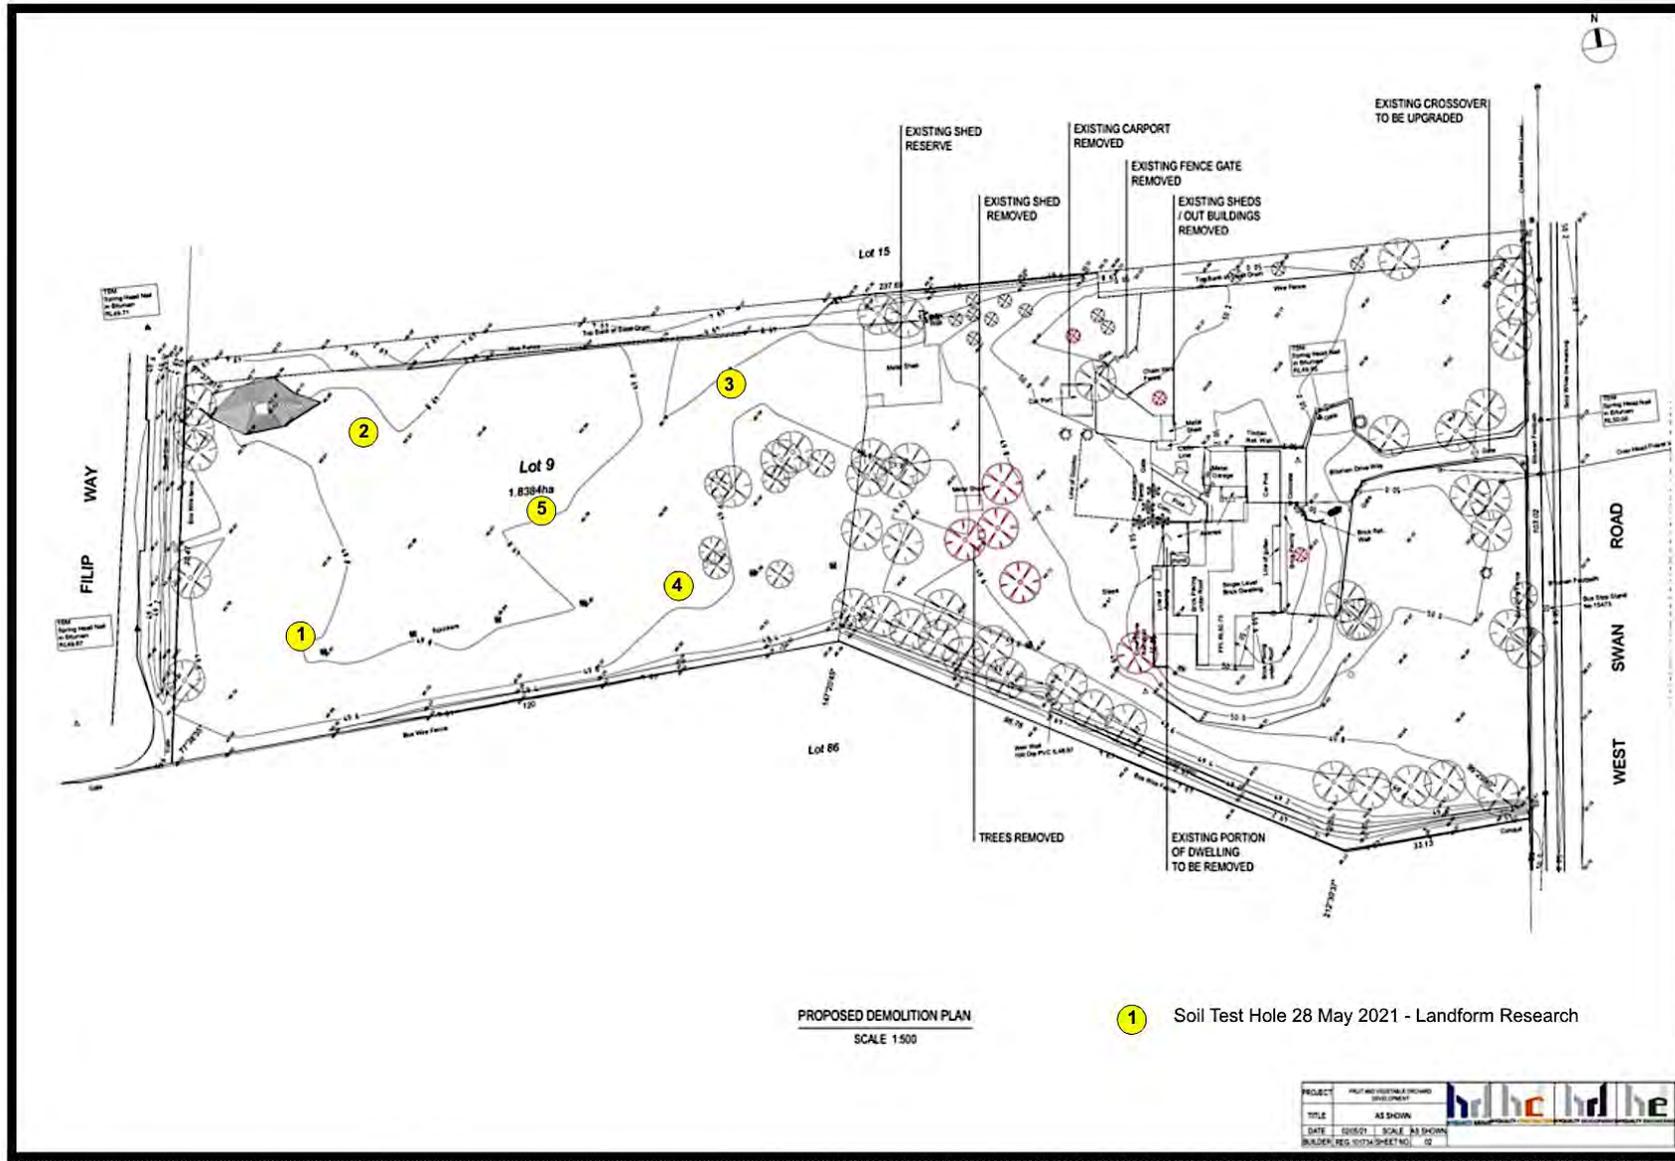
Contour Plan and Soil Test Holes. Note the Local datum. The land is at 17 metres AHD
